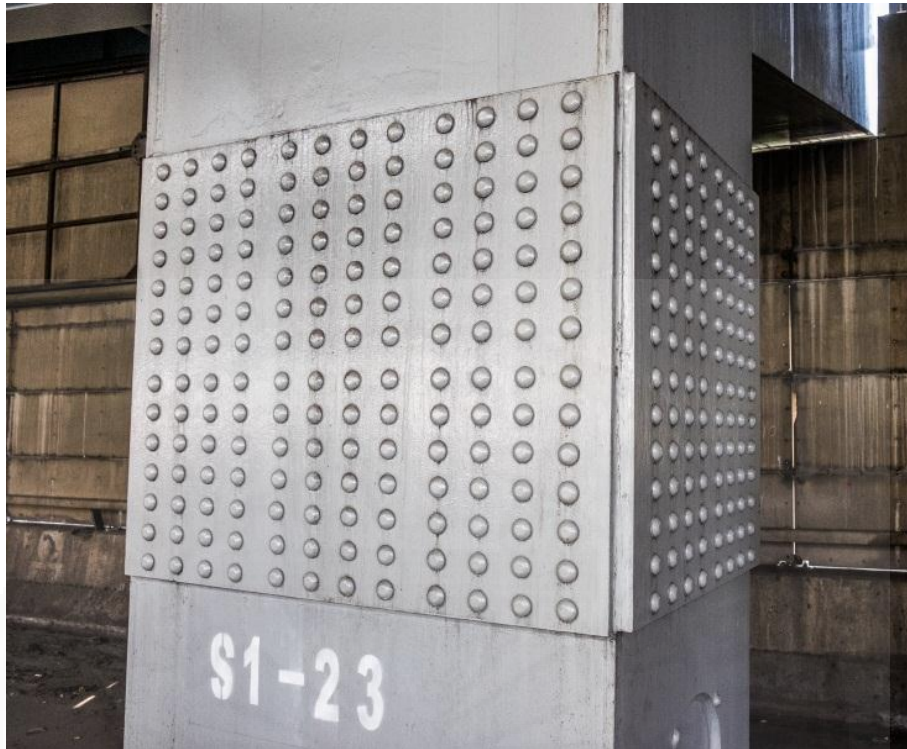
Painted steel surface of Highway Bridge B (2)
